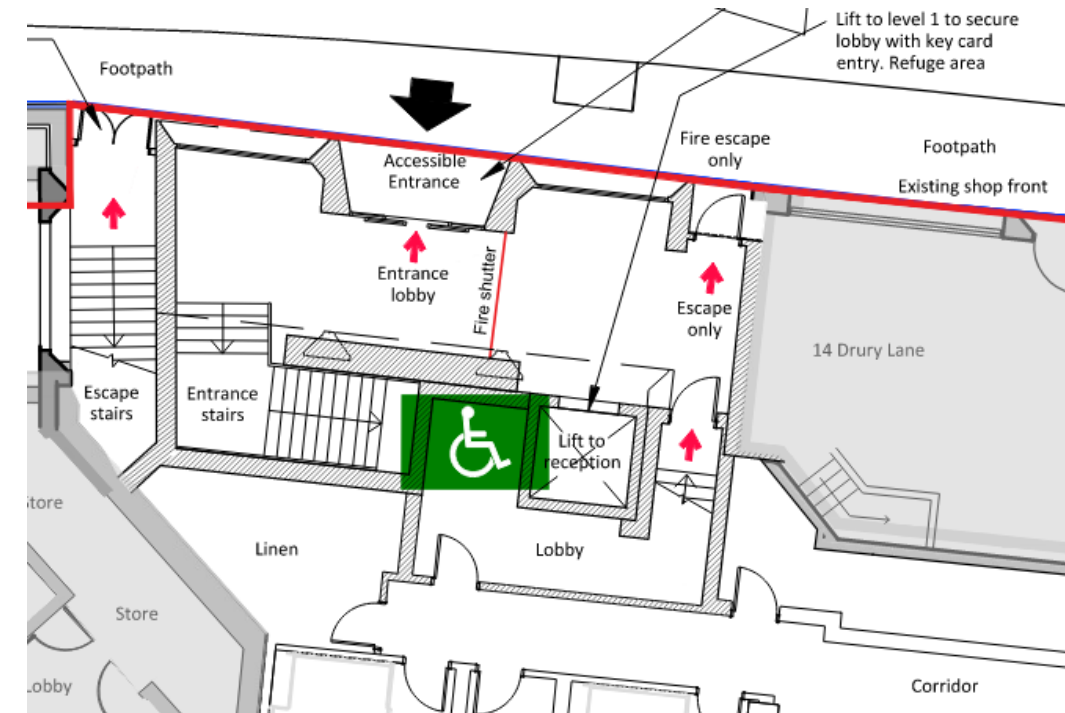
Drury Lane entrance with protected escape route from stair and lift
